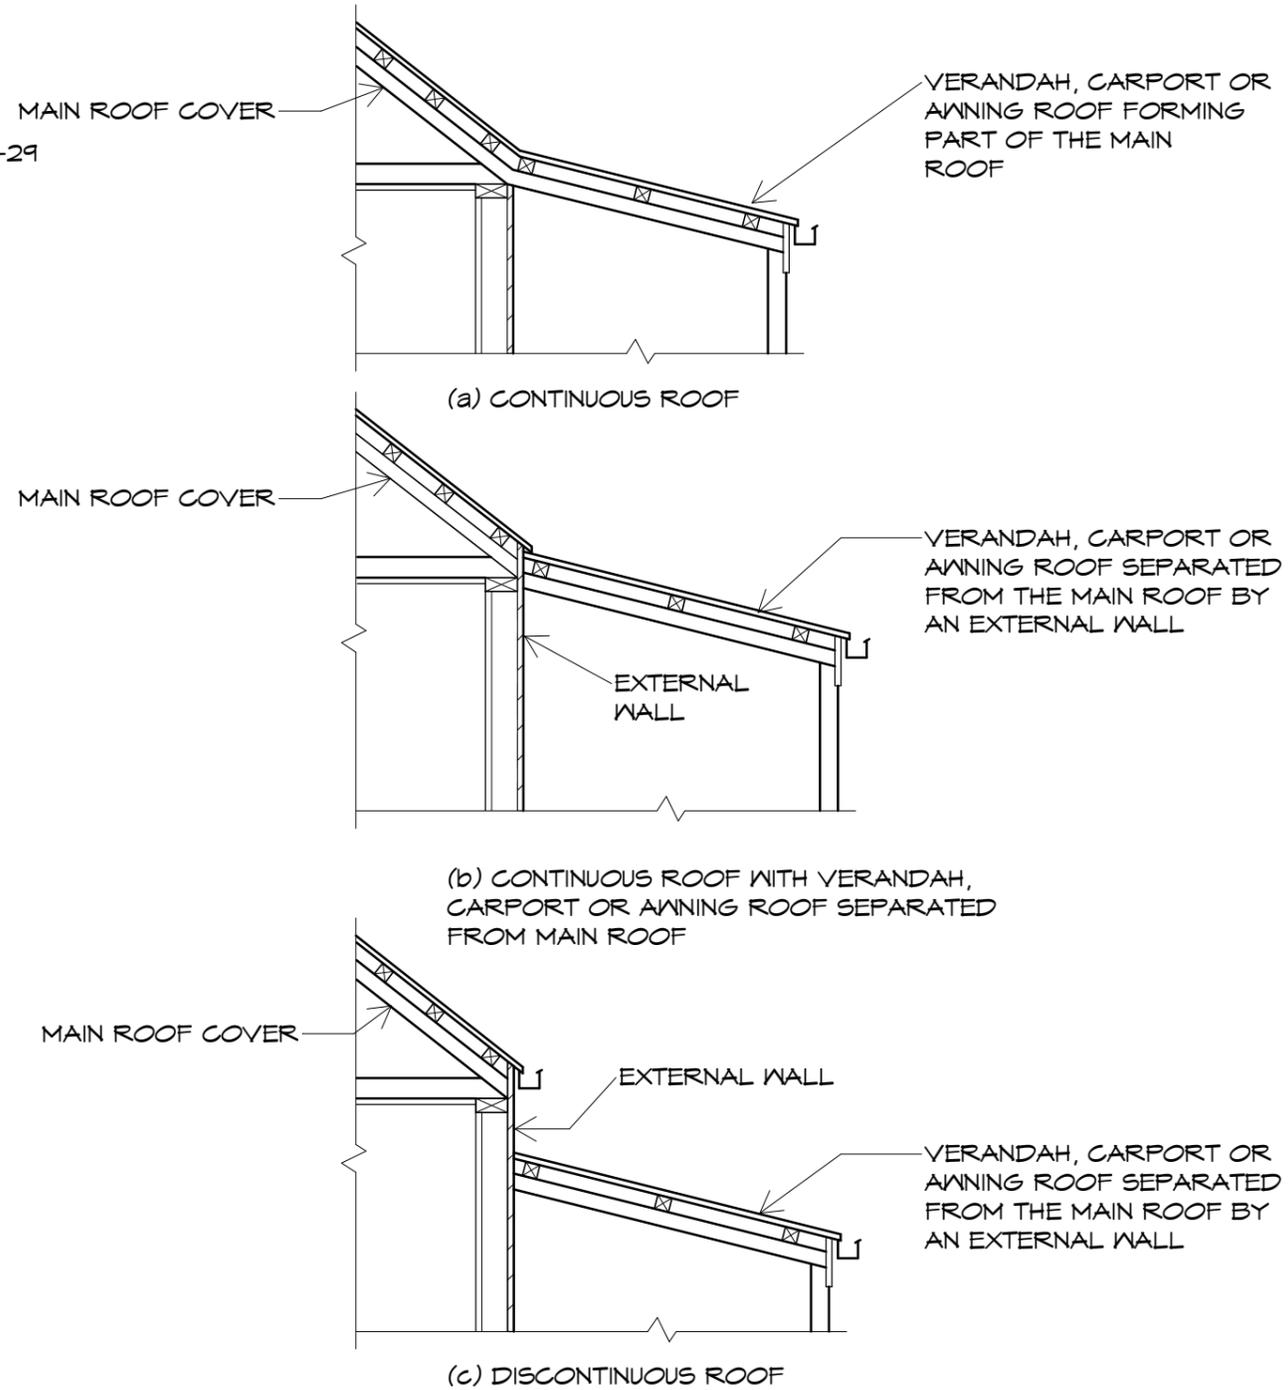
VERANDAH, CARPORT OR AWNING ROOFS SHOWING CONTINUOUS AND DISCONTINUOUS ROOF TYPES
